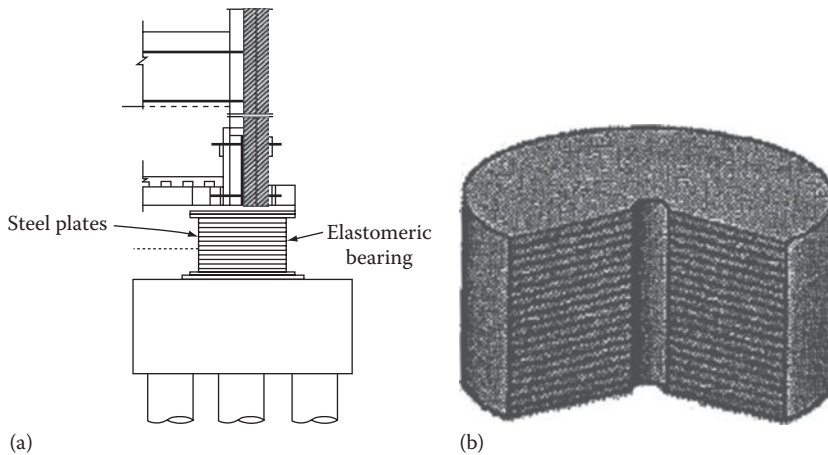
Elastomeric isolators. (a) High-damping rubber bearing made by bonding rubber sheets to steel plates and (b) high-damping rubber.
